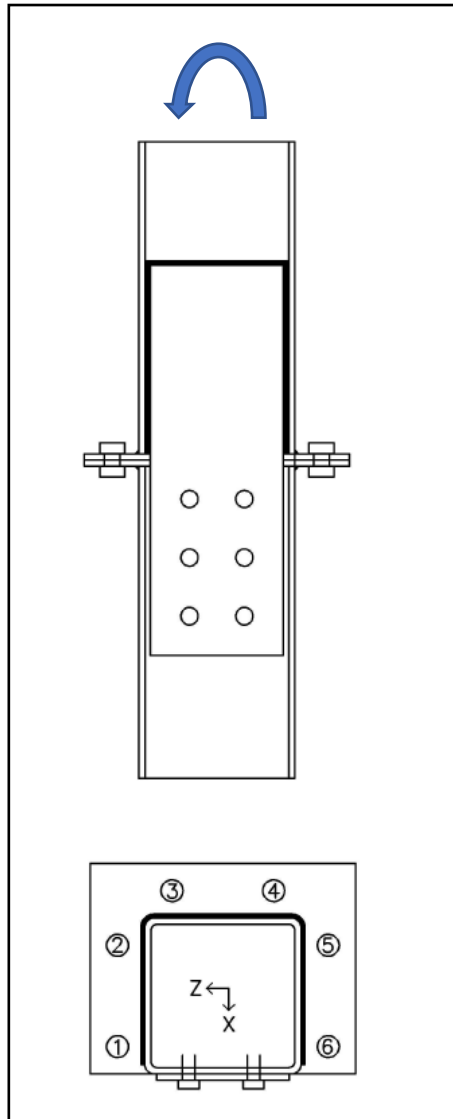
Plan and elevation specimen IC-1 (case 3)
